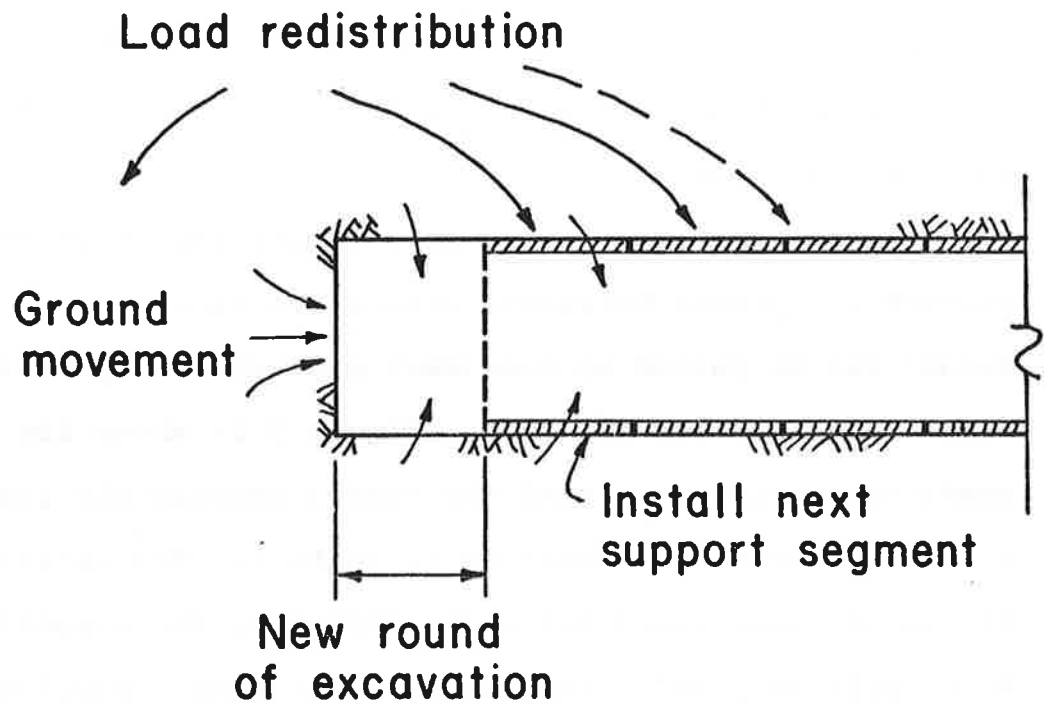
GROUND MOVEMENT AND LOAD REDISTRIBUTION RESULTING FROM TUNNEL EXCAVATION
